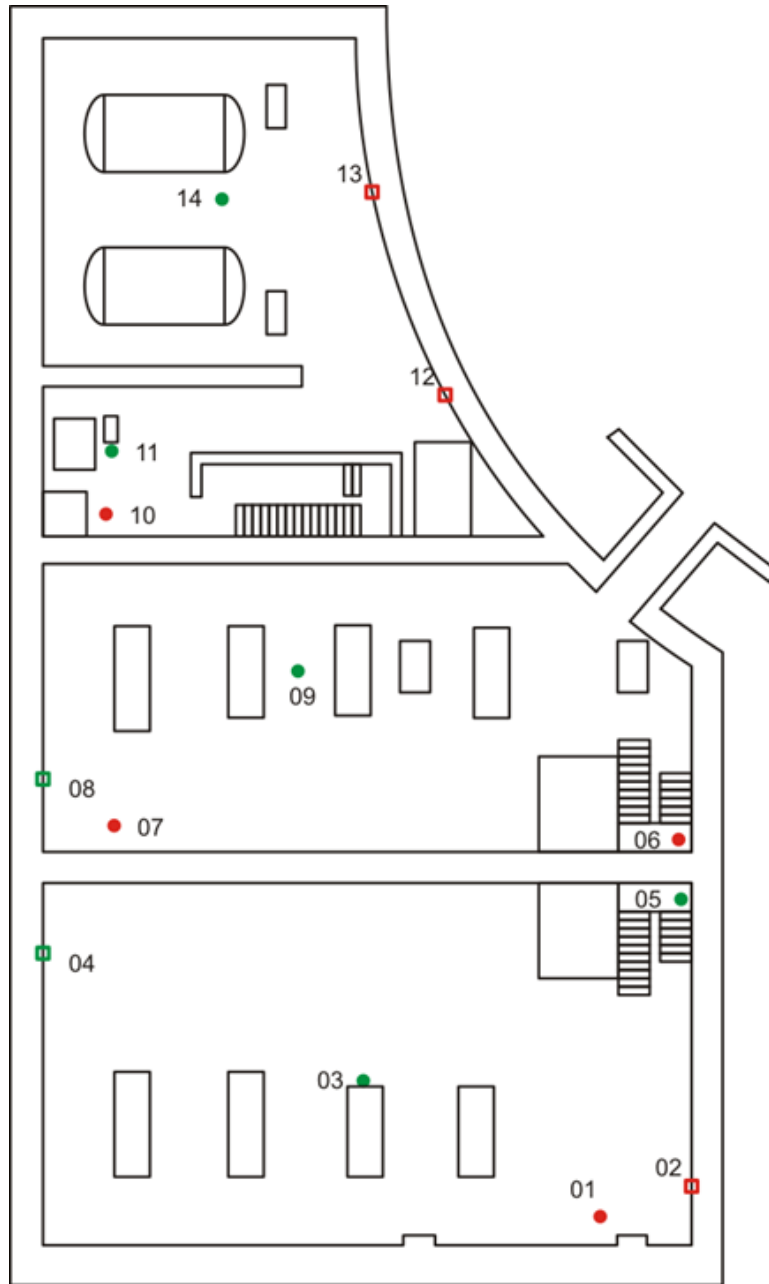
Volumetric Concrete Sample Locations in Auxiliary Building 971 Foot Elevation
